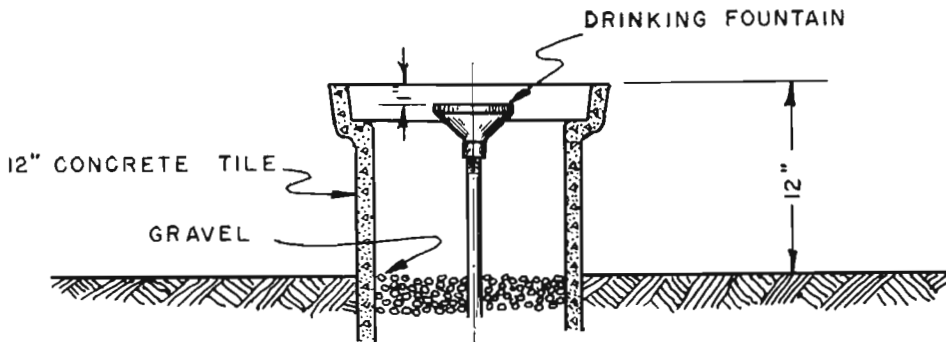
How to build a drinking fountain to prevent water spillage.
